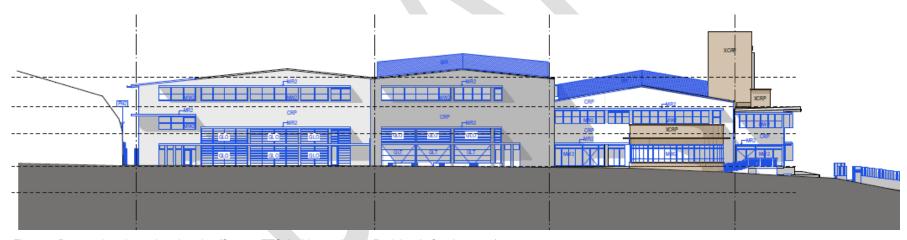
Proposed northern elevation plan (Source: TZG Architects, A-210, Revision A, October 2019)
